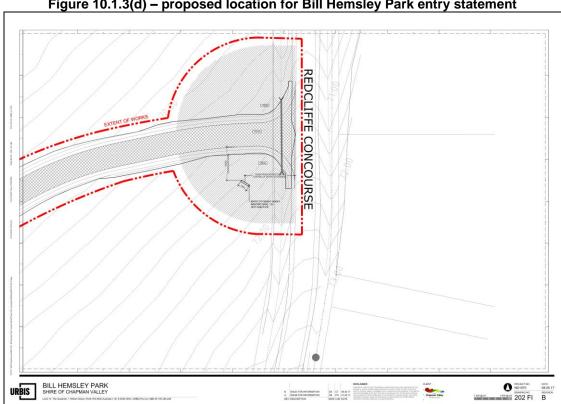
(d) – proposed location for Bill Hemsley Park entry statement
